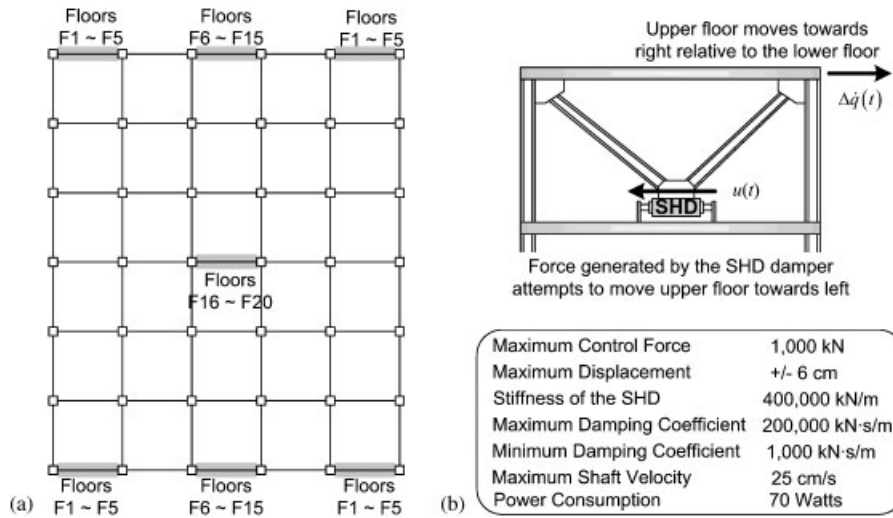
Instrumentation of semi-active hydraulic dampers (SHD) in the 20-story structure: (a) layout of dampers on the floor plans and (b) key parameters of the dampers.
